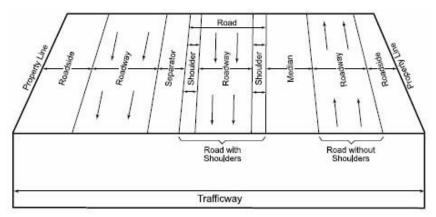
Trafficway: Roadside, Roadway, and Median defined (AMVCR, 2014).
